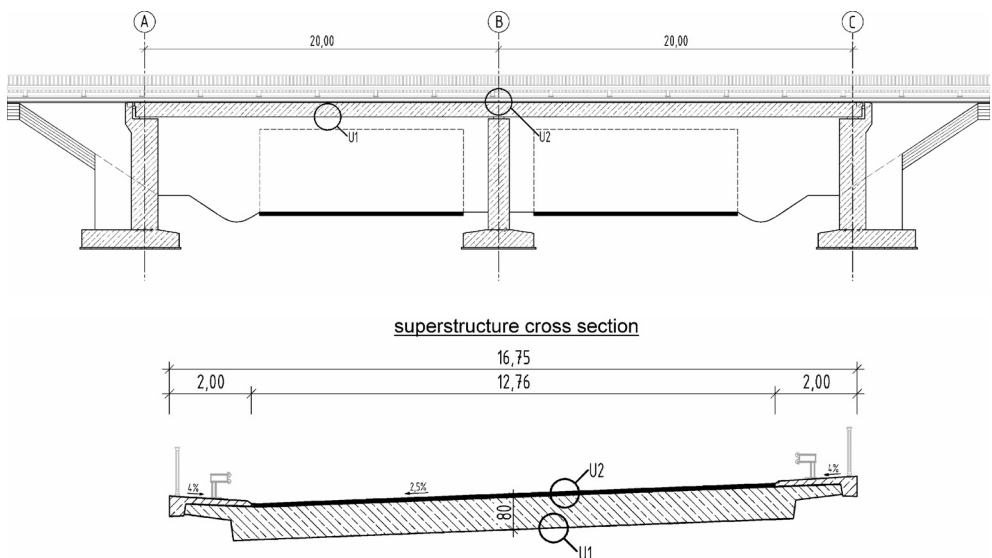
Example for a prestressed concrete bridge and design regions U1 and U2.
